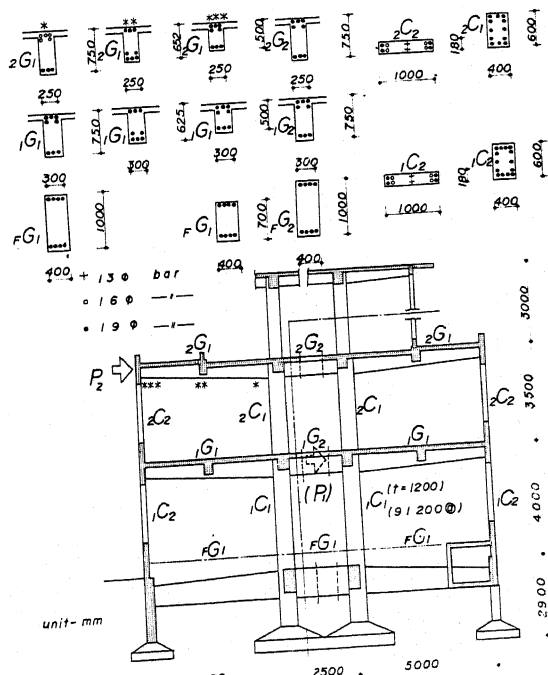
SKELETON OF HAMAMATSU OPEN FRAME (SHEAR WALL ONLY)
